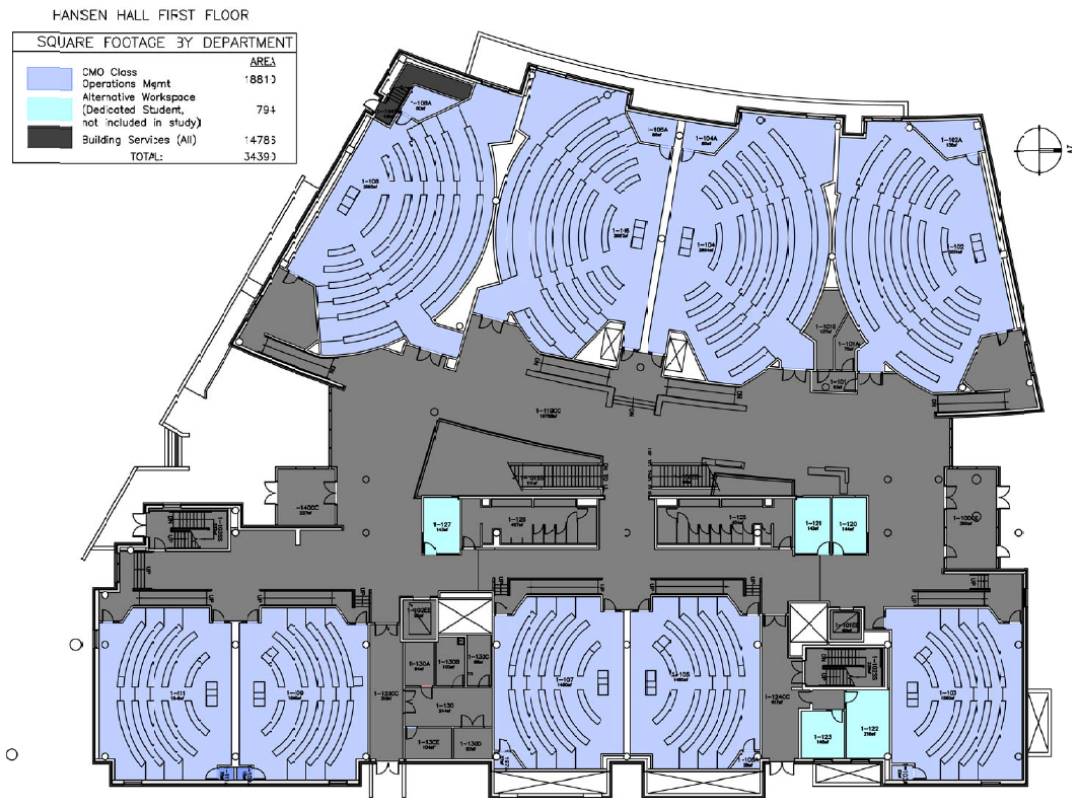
Hanson Hall, 1<sup>st</sup> Floor, Color shading indicates space allocations AWSp, PWSp, and BSA
